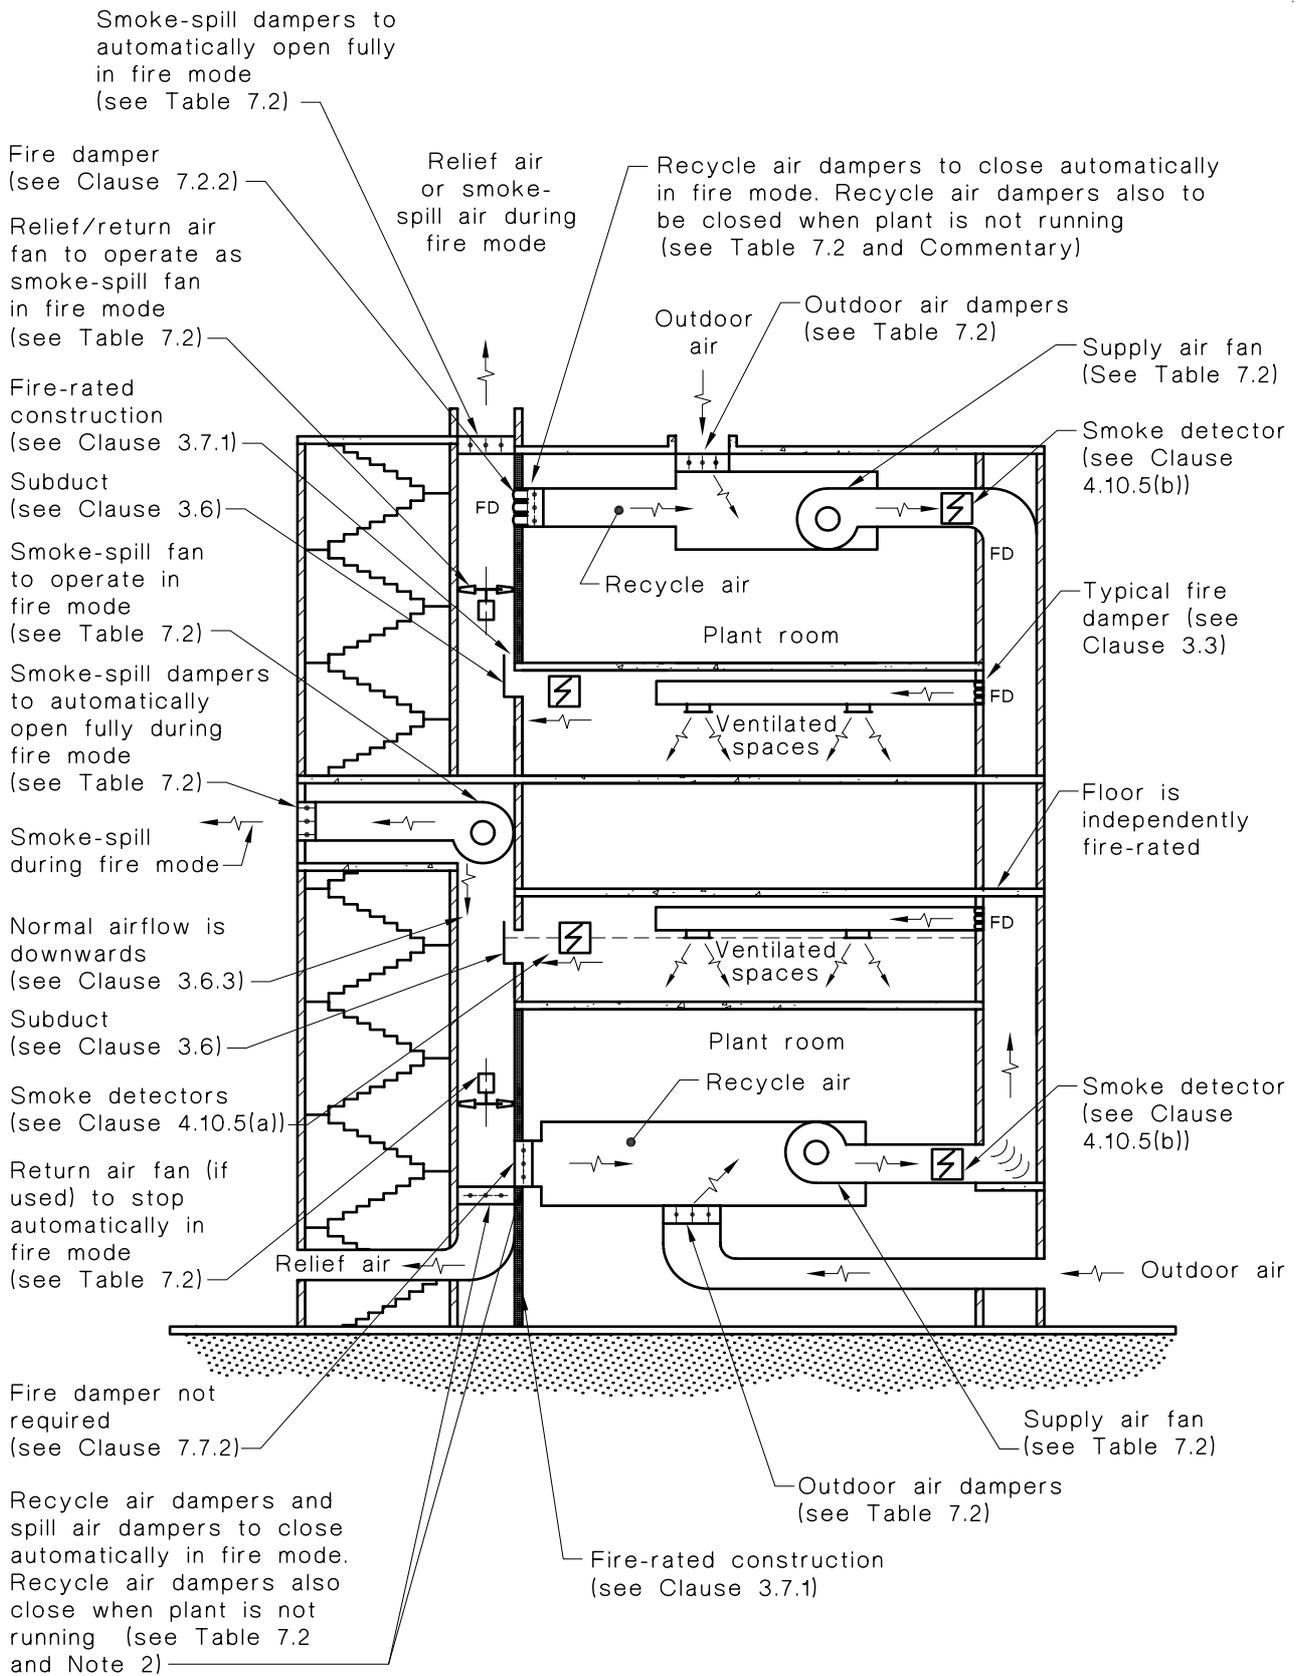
AIR PURGE SYSTEM—TYPICAL INSTALLATION OF SEPARATE SYSTEMS WITH PLANT ROOMS ABOVE AND BELOW SPACES BEING SERVED
